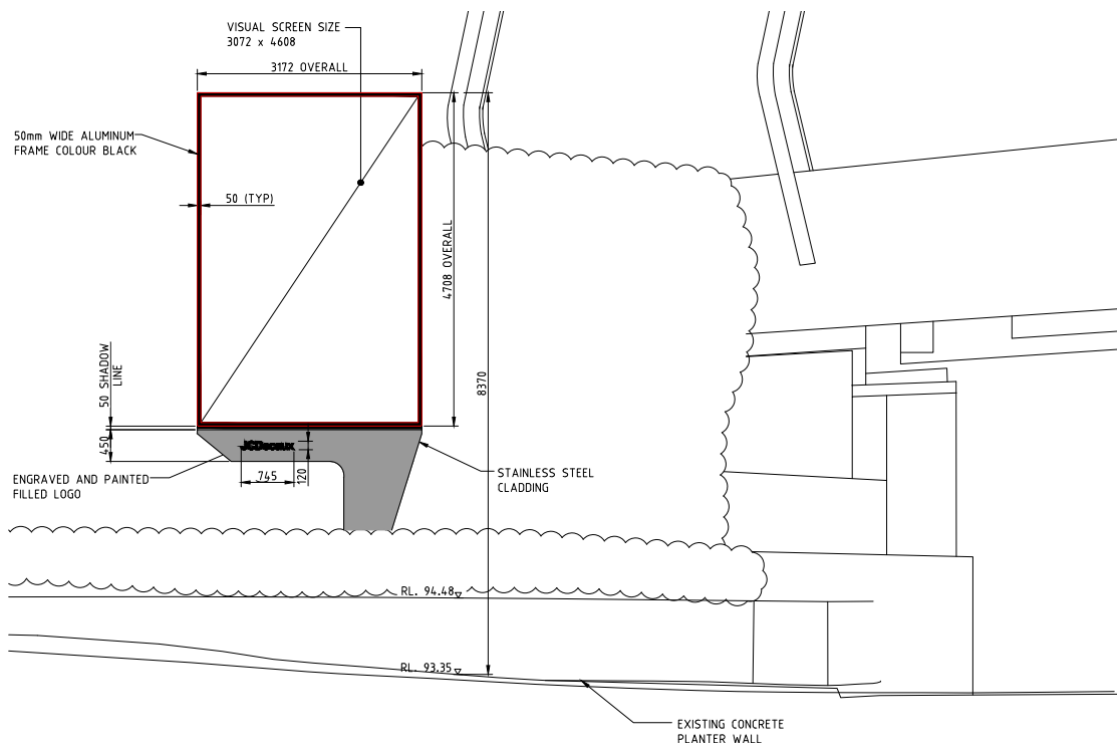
Digital signage plan (Source: Dennis Bunt Consulting Engineers)
